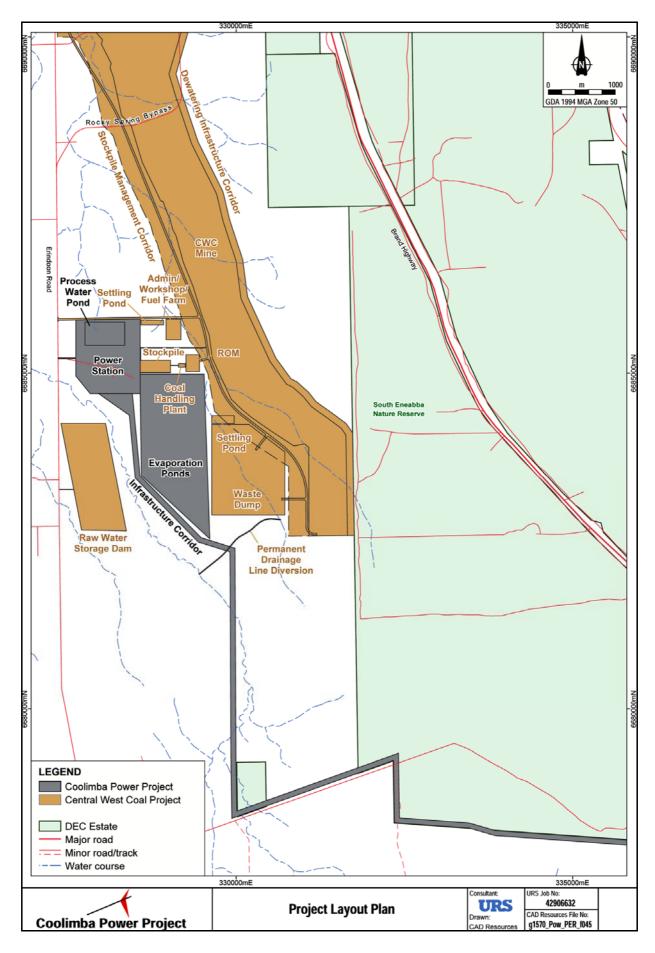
Project layout plan (Source: Figure 1-3 from URS Australia Pty Ltd, 2009)
